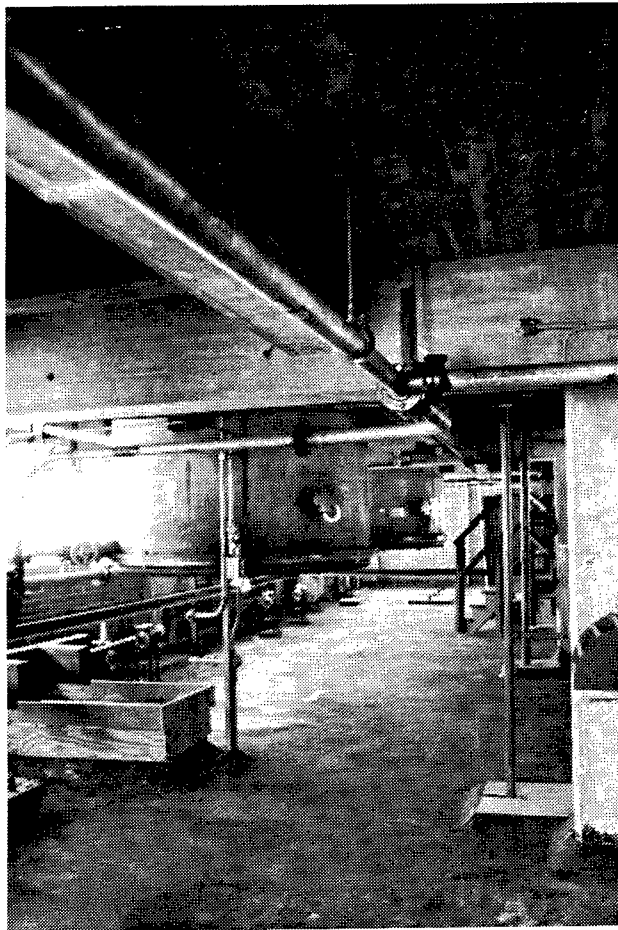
Building E2: Lower Wash Tank Room with lower portions of Wash Tanks.
